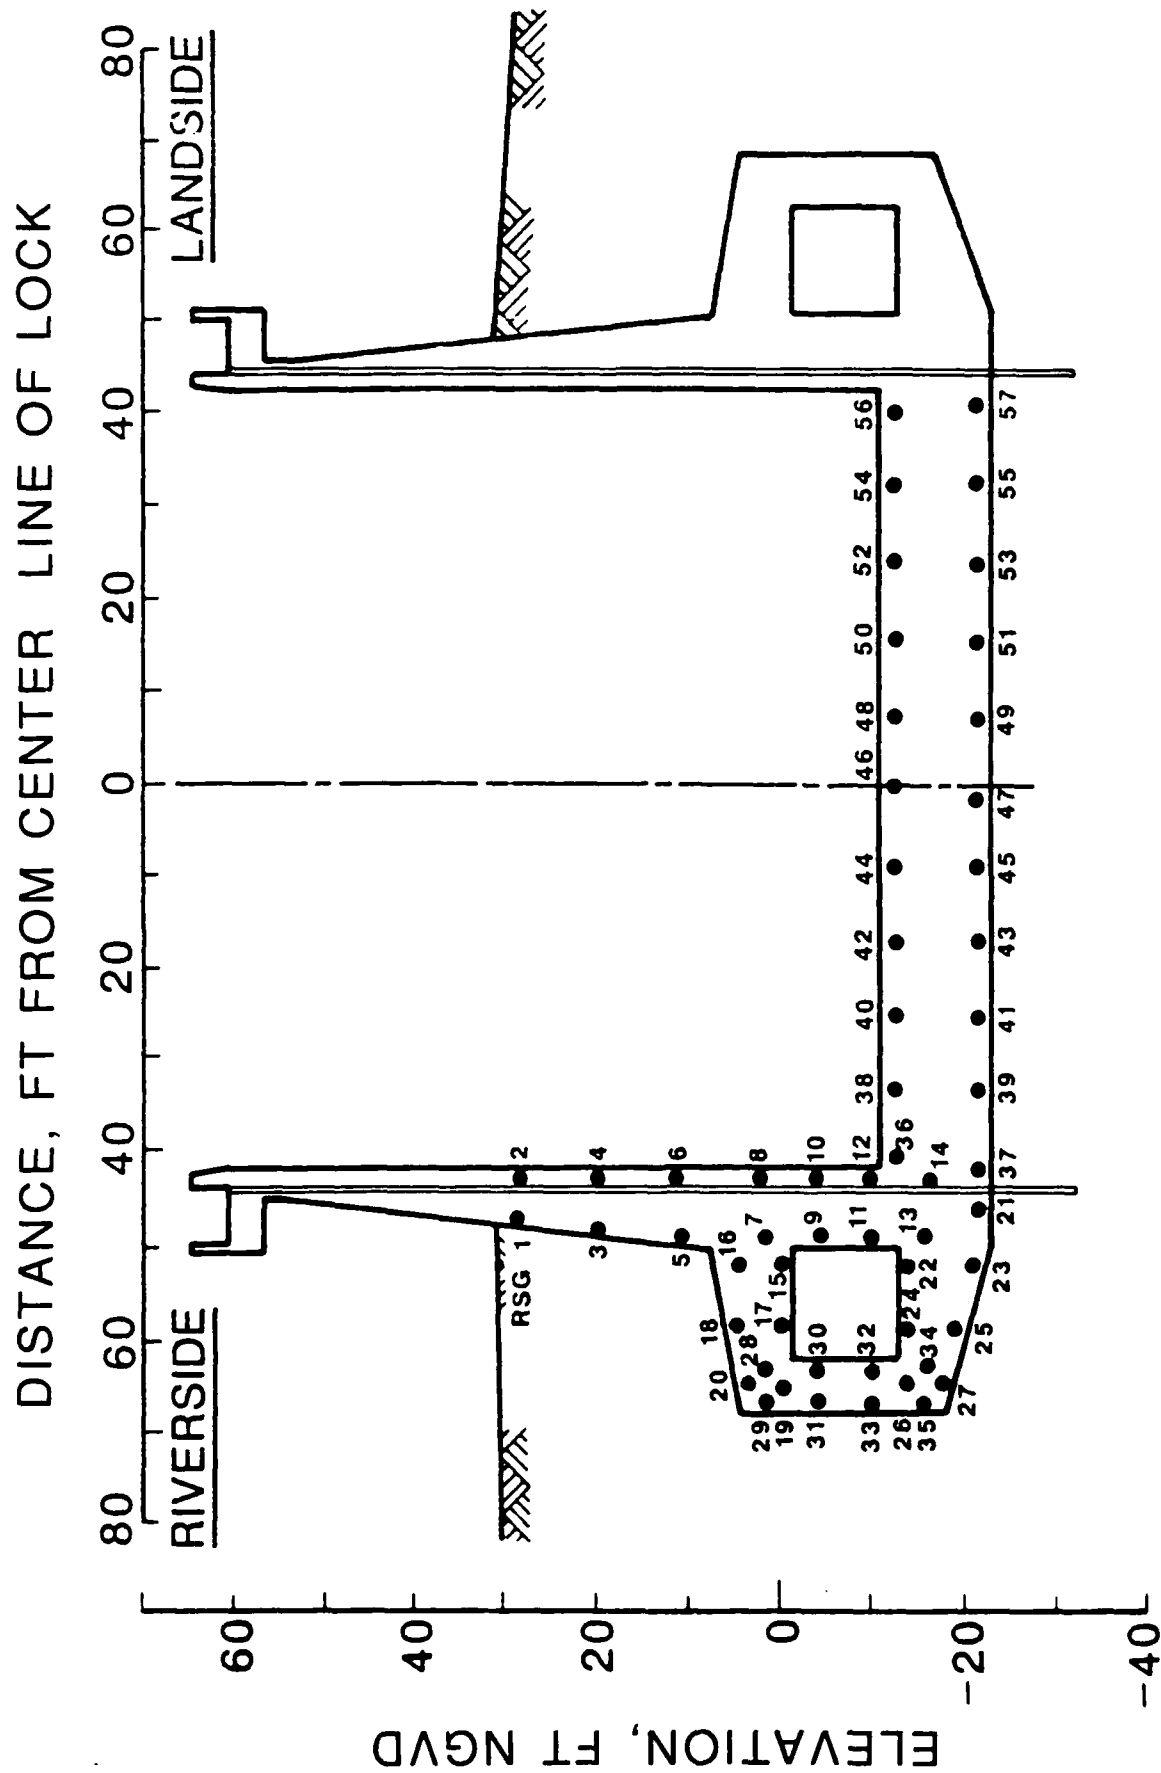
Reinforcing steel strain gage location in Monolith L-10
